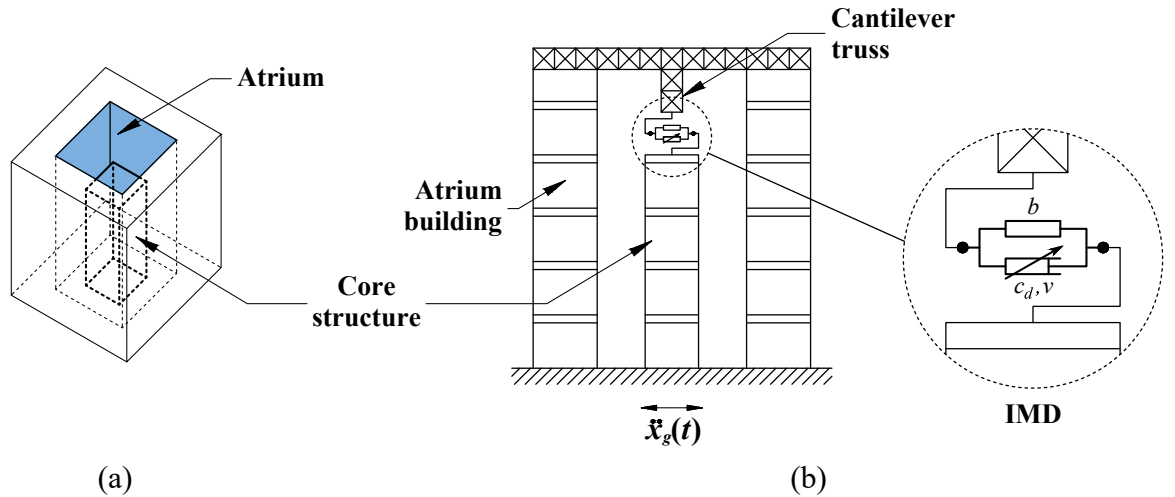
(a) A centralized atrium building with a core structure (b) proposed truss-IMD system.
